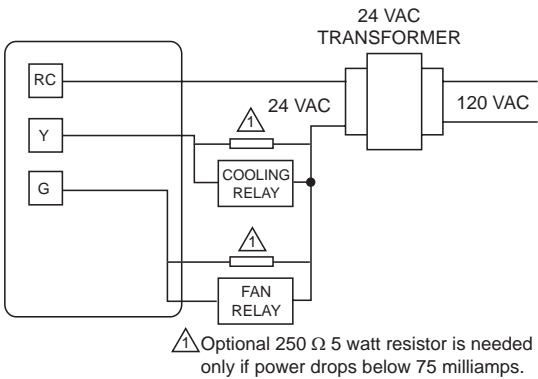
T204 Wiring to Heating/Cooling System With Single Transformer.
